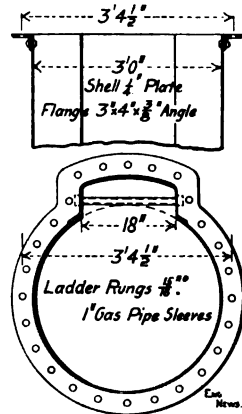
DETAILS OF MATERIAL SHAFTS FOR MAIN PIER CAISSONS.
